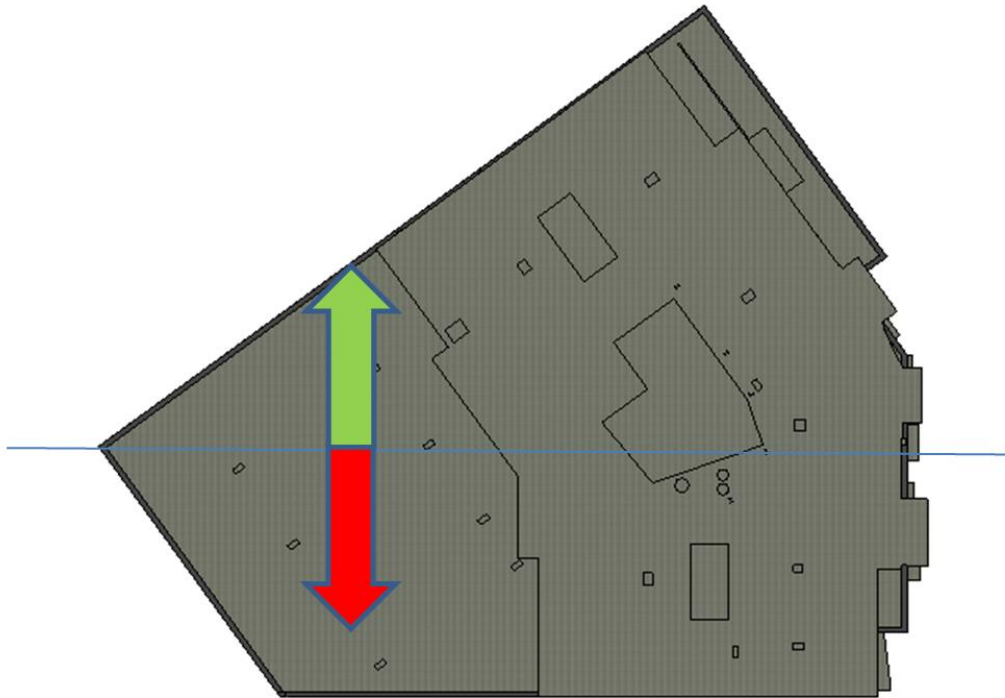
Demolition Layout Green Arrow=North Openings, Red Arrow=South Openings
